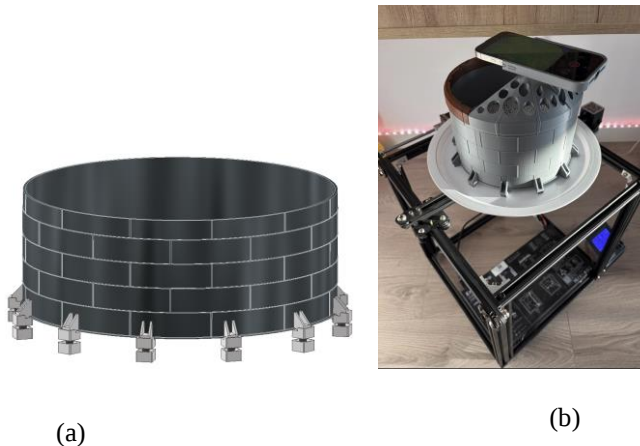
(a) The 3D model of the Tank; (b) Picture of the constructed assembly.
